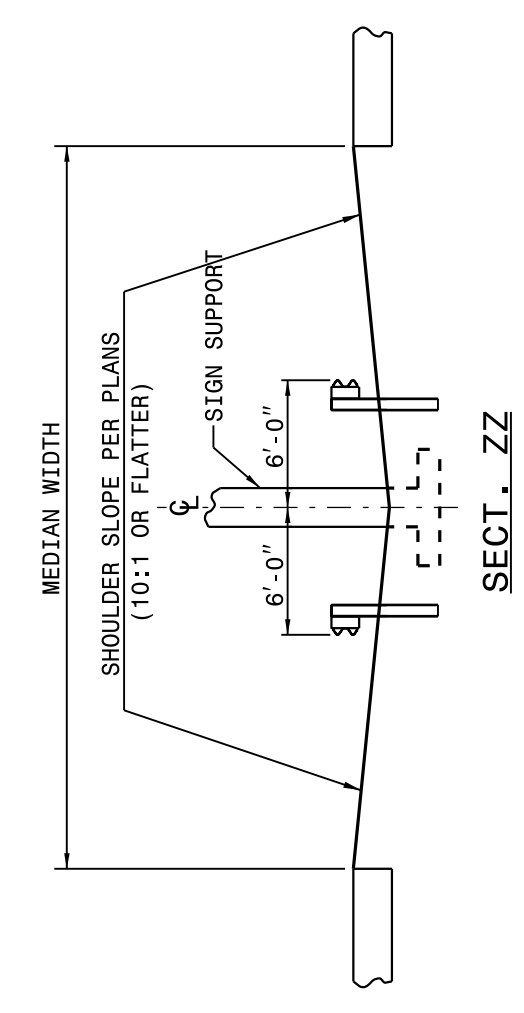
DETAIL OF GUARDRAIL AT MEDIAN SIGN SUPPORT
